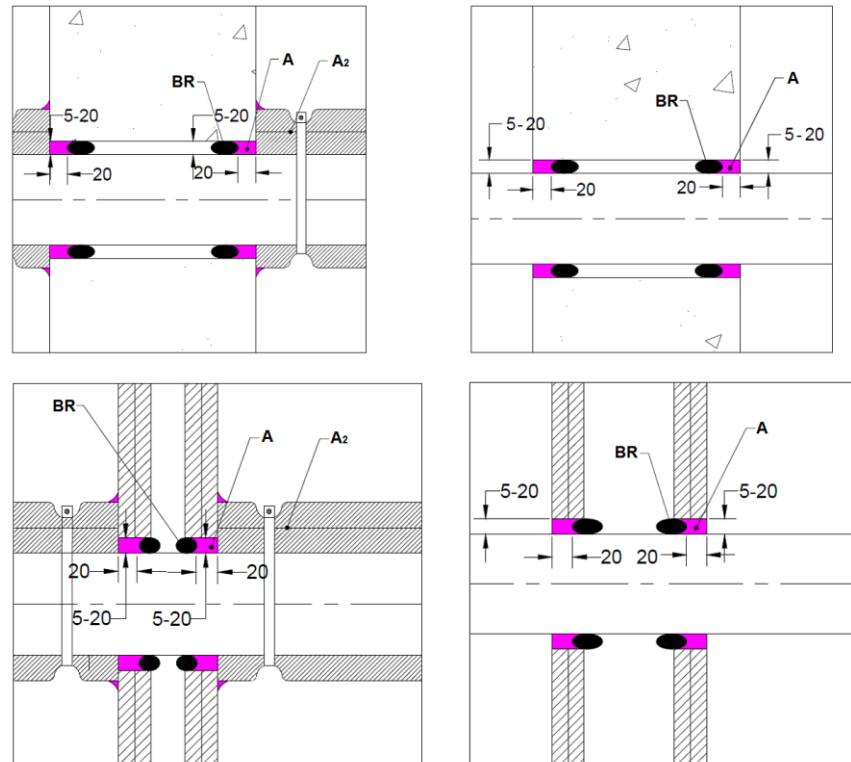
Figure D – Sealant detail for Rigid and Flexible walls with and without pipe insulation
